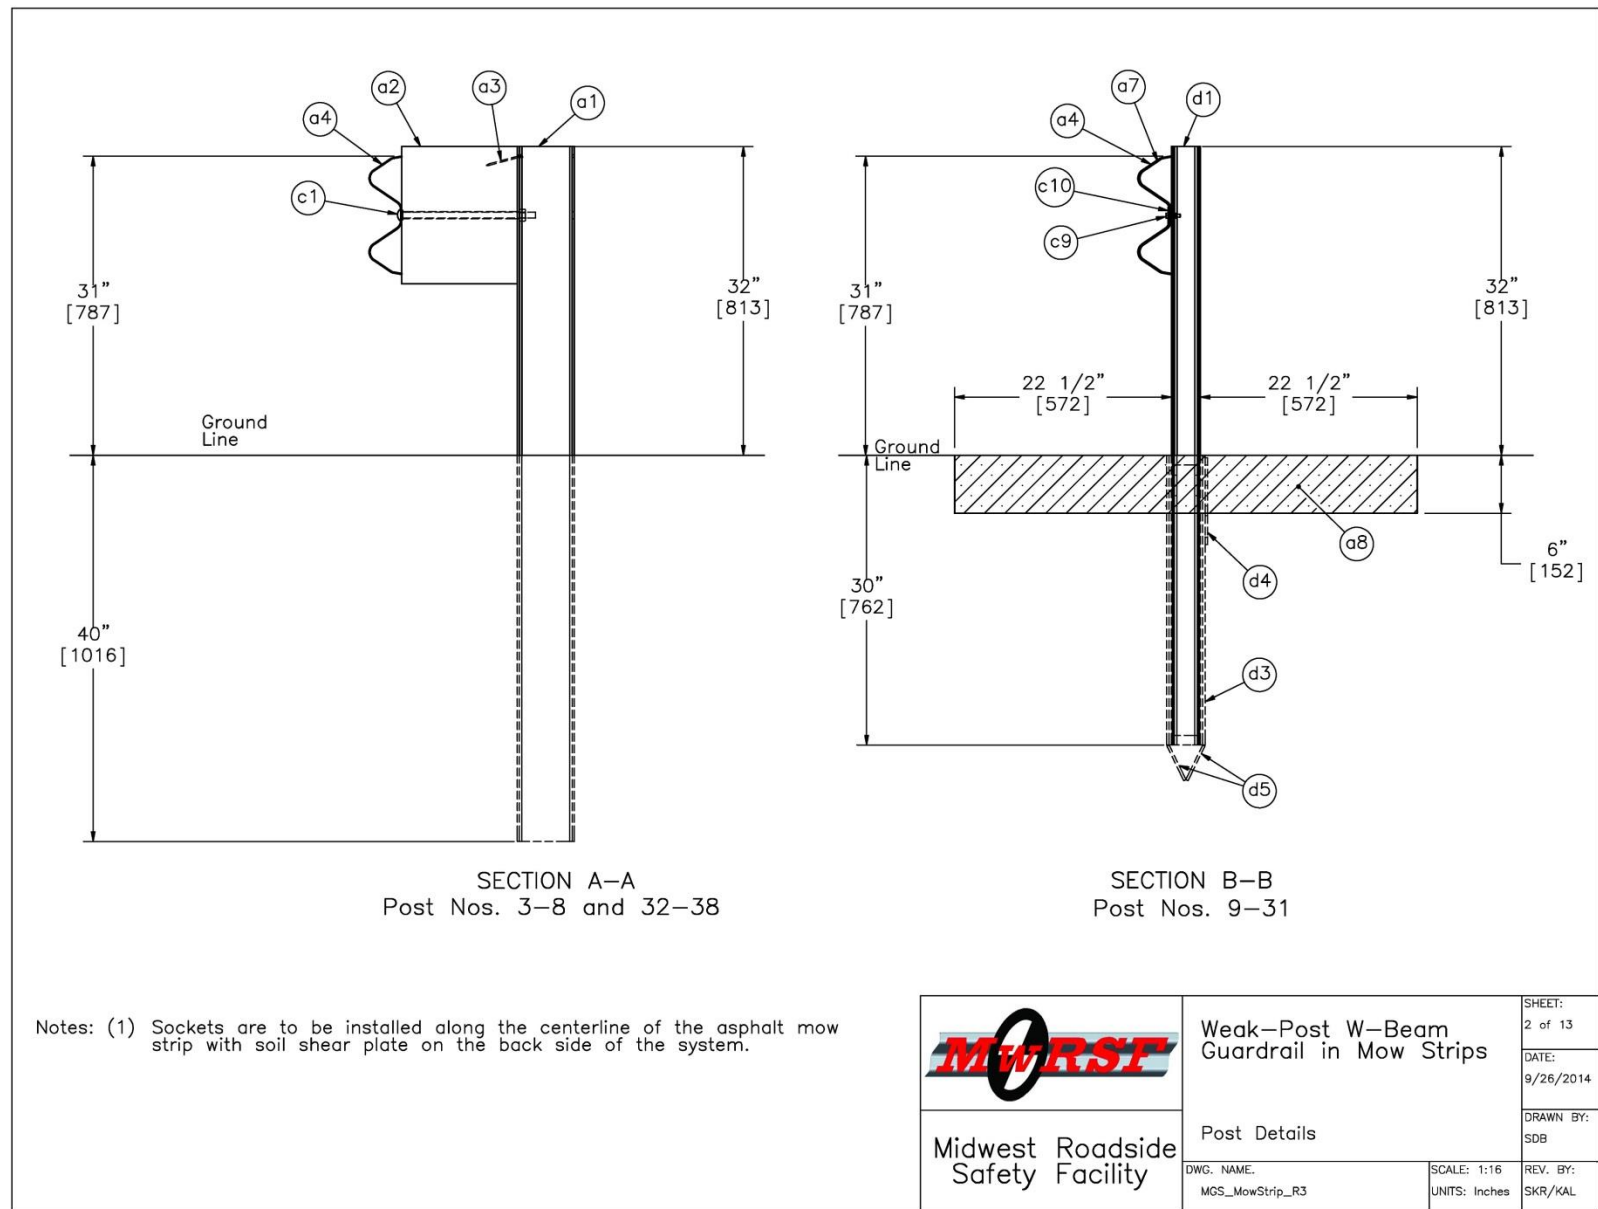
Guardrail Post Details, Test No. MGSMS-1
